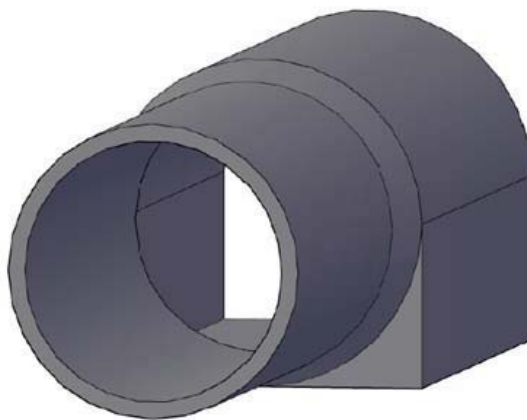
Connection of a Horseshoe Section Tunnel with a Circular Section Tunnel
